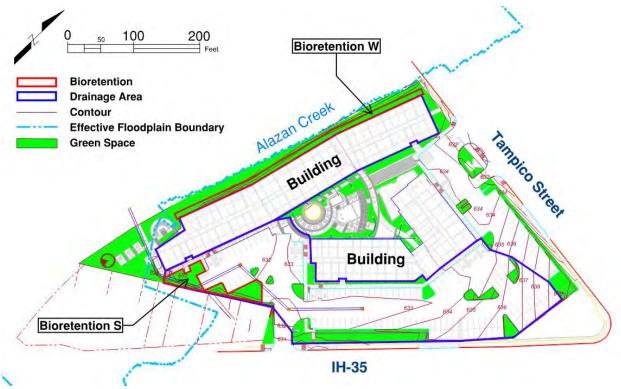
Proposed BMP Layout on Subbasin 420 Site
